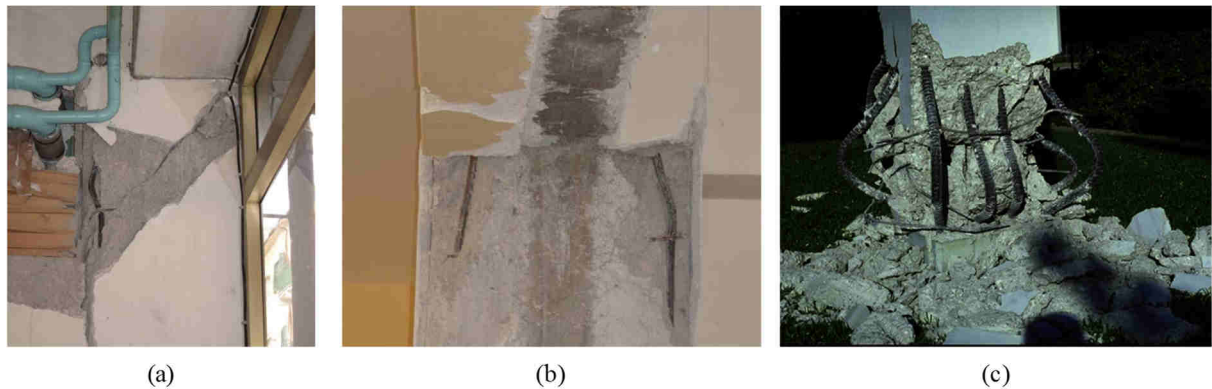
RC columns subjected to buckling: (a) shear crack and (b) absence of adequate stirrups at Scuola Media Statale Craducci, Aquila, Italy (Salvatore et al., 2009); (c) failure at the bottom of a column of the Imperial County Services building due to not adequate confinement (Comartin et al., 2004).
